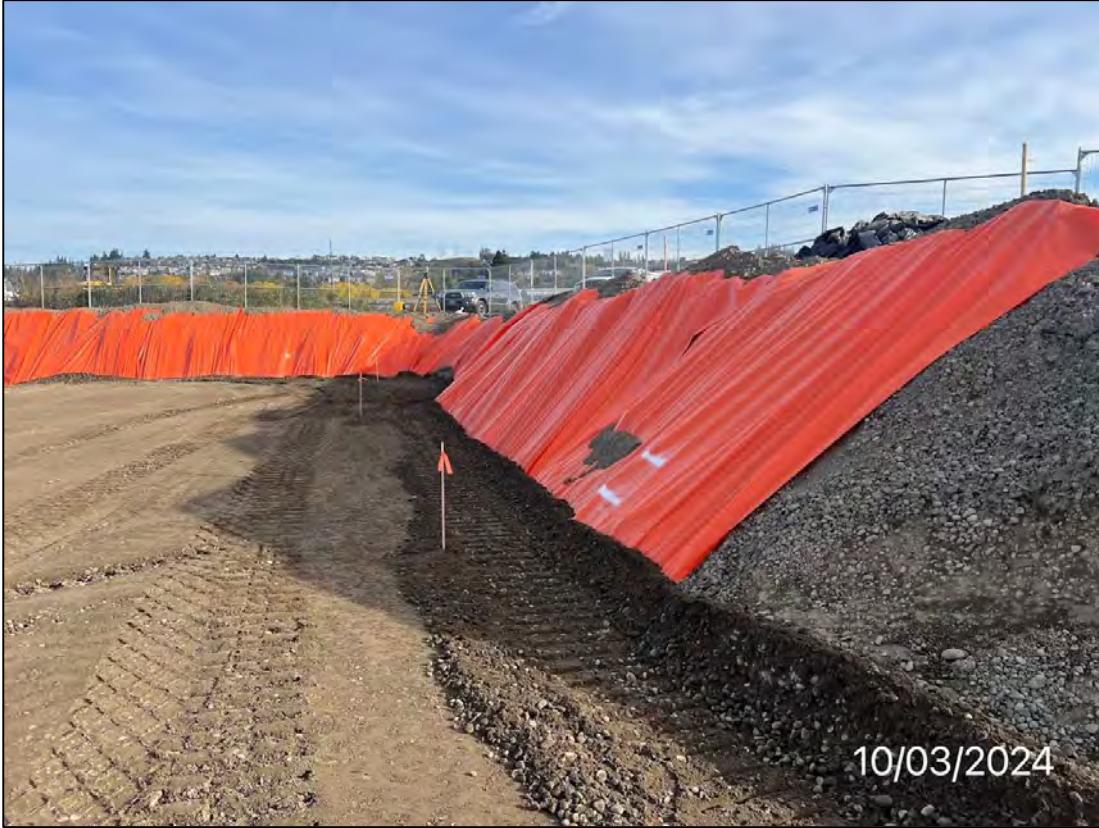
Survey stakes placed at edge of Building B show insufficient excavation boundaries to encompass the additional 15 foot zone of influence, facing north, 10/3/24.
